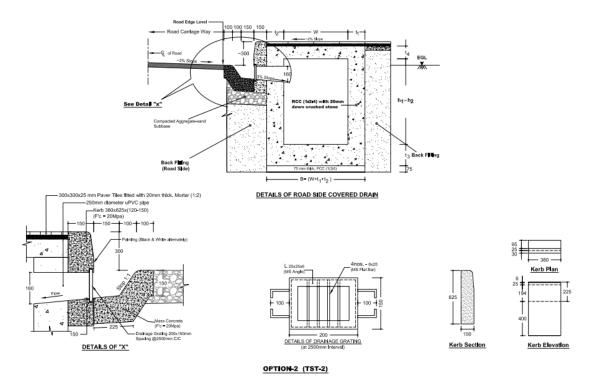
Typical section for Tertiary closed drain (type-1)
